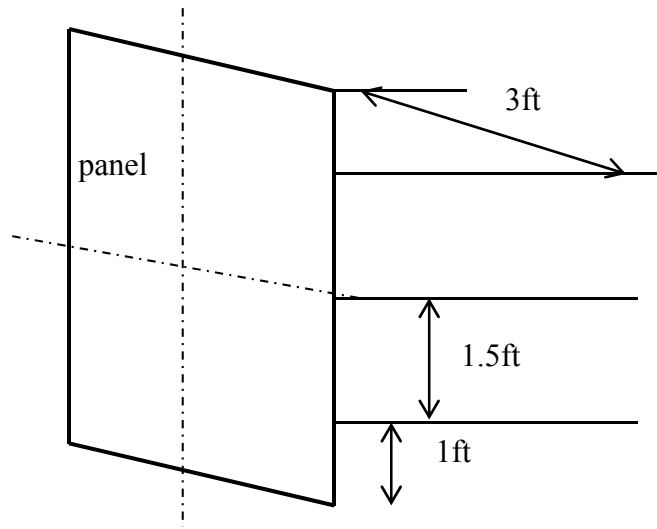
Strips Spacing for Each Panel of MSE Wall.
